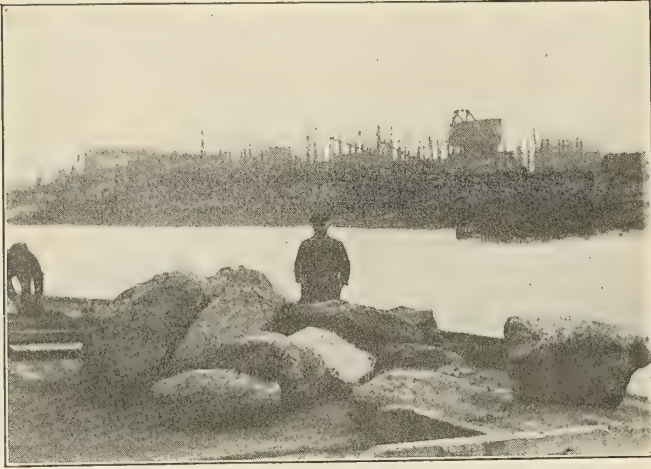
BOULDERS DREDGED FROM THE HARBOR.
